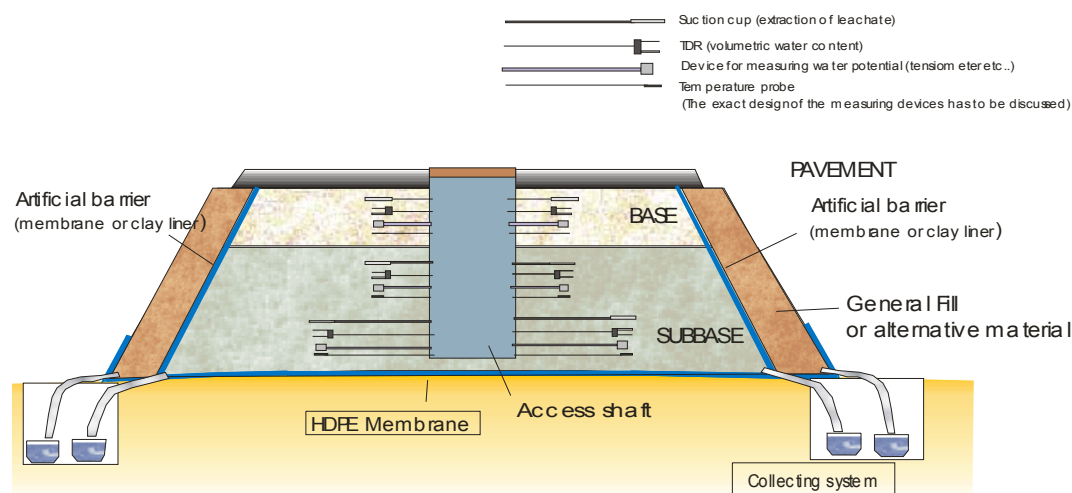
Section 4 of the trial embankment (figure is not to scale)
